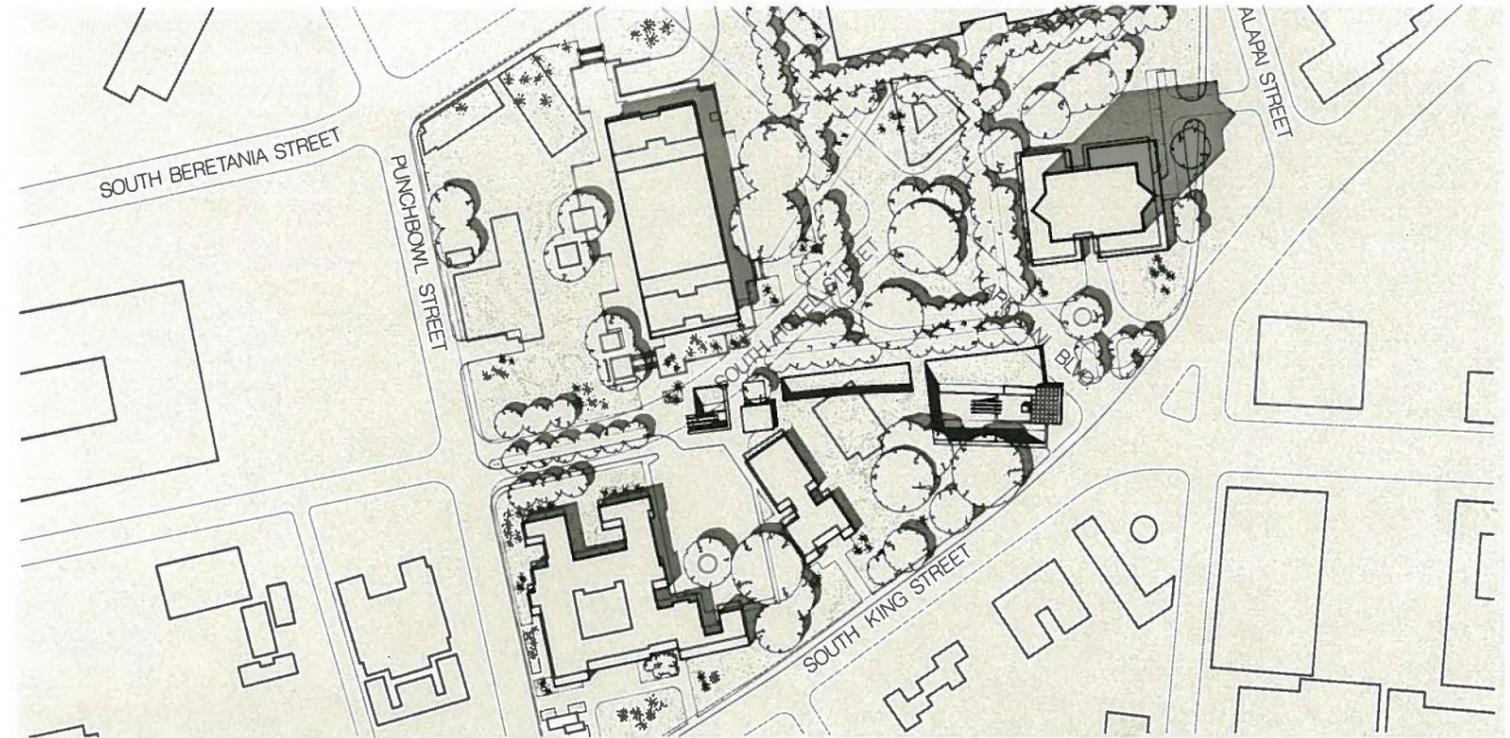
Civic Center Urban Design Concept Site Plan
